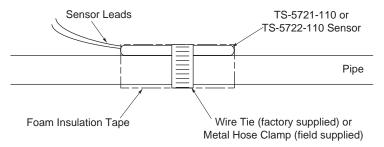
Typical TS-572x-110 Strap-On Sensor Installation.
